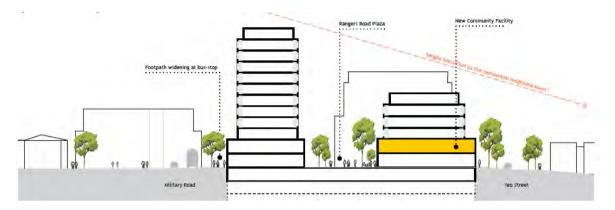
Cross section of 'Site 3' – Rangers Road (source: Rescinded MRCPS, p. 62)
